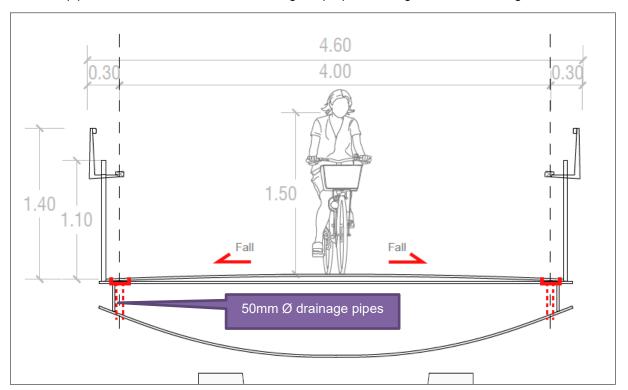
Indicative sketch of the proposed bridge drainage arrangement
